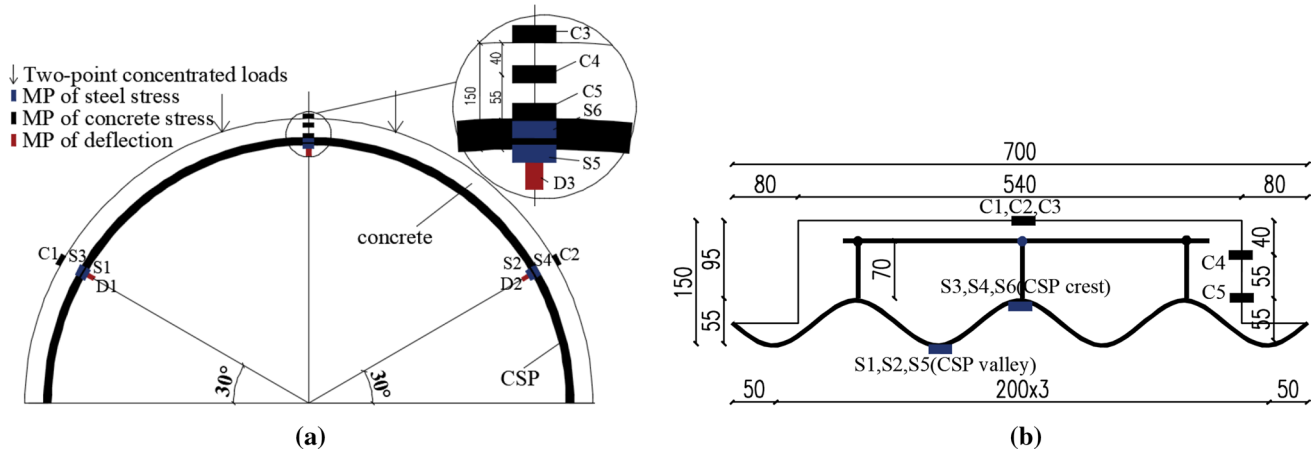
Measuring point (MP) arrangement of the arches (mm). a Vertical section. b Cross-section
